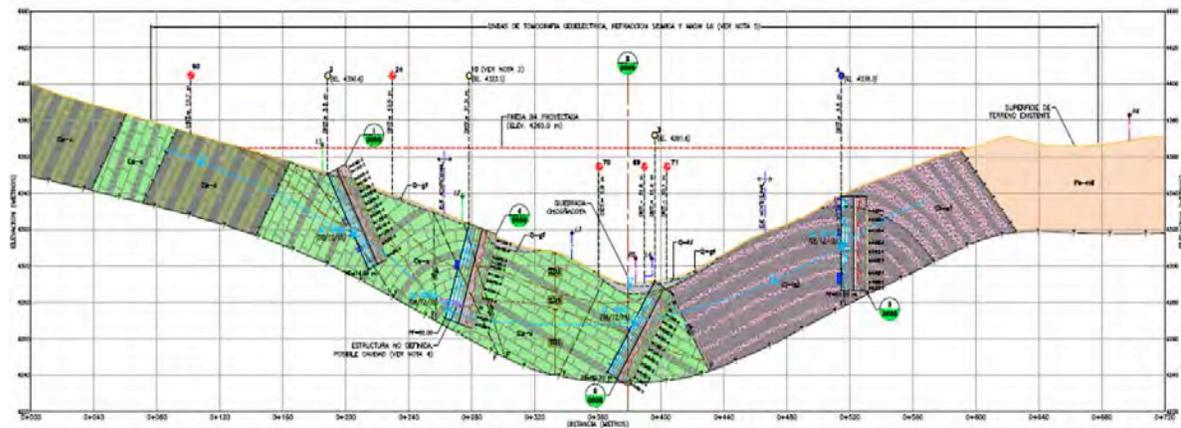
Tailing Storage Facility B4 – Cross Section (Knight Piésold, 2016).
